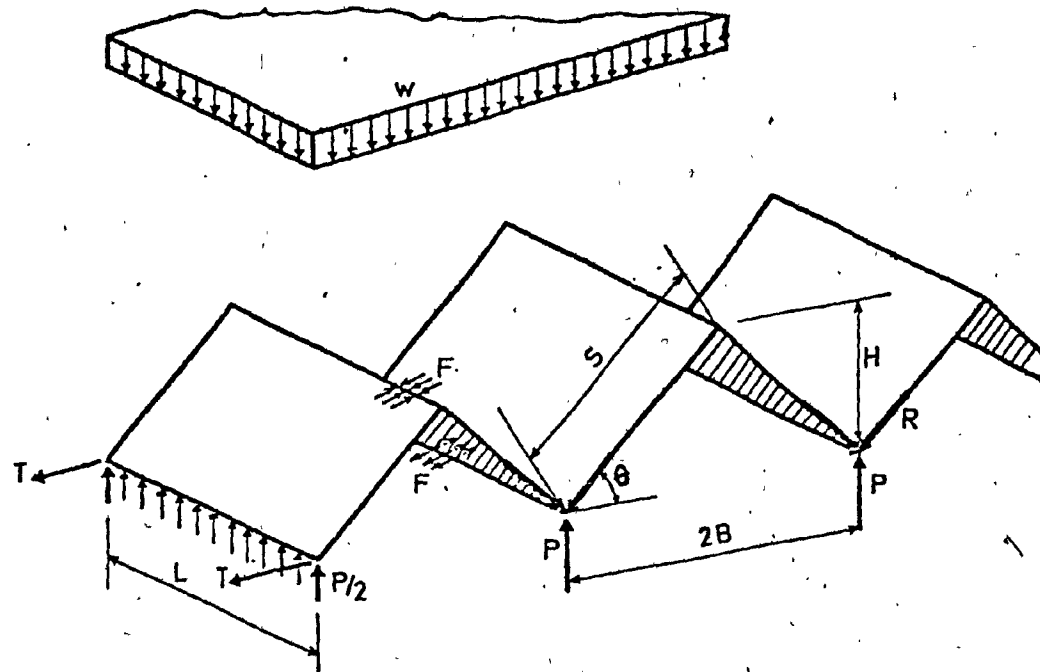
CROSS-SECTIONAL VIEW OF FOLDED PLATE (REF. 32)
